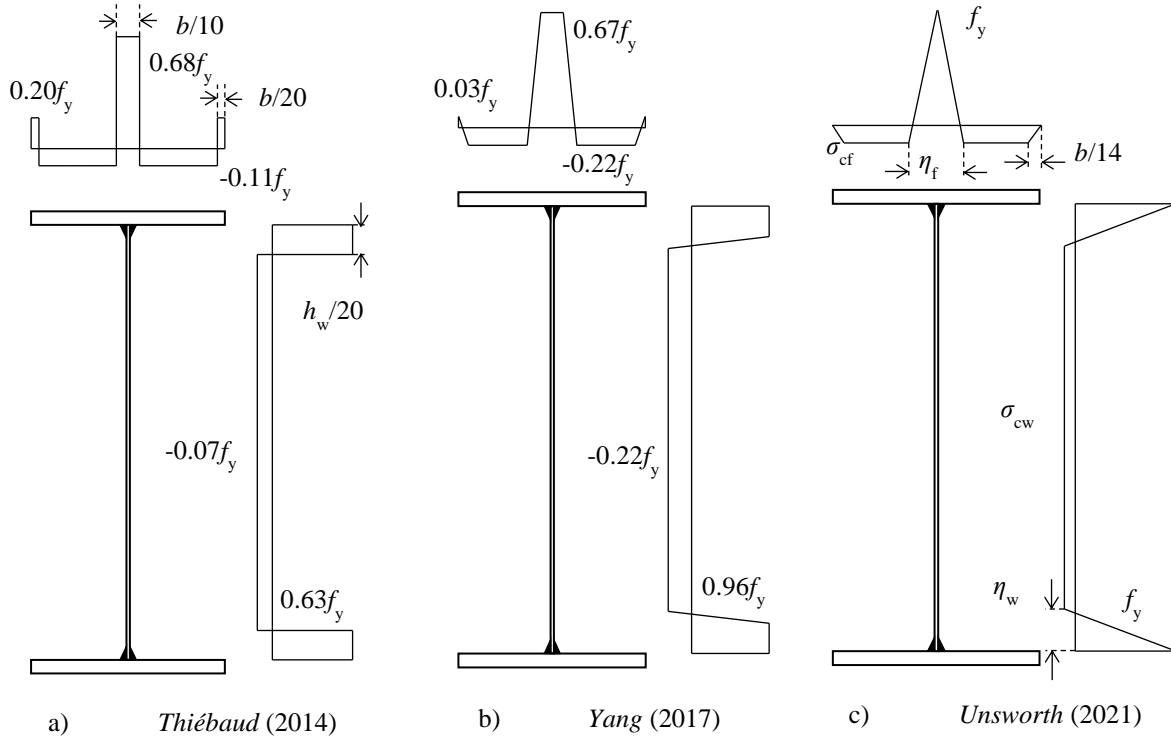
Existing models for welded members with flame-cut flanges
